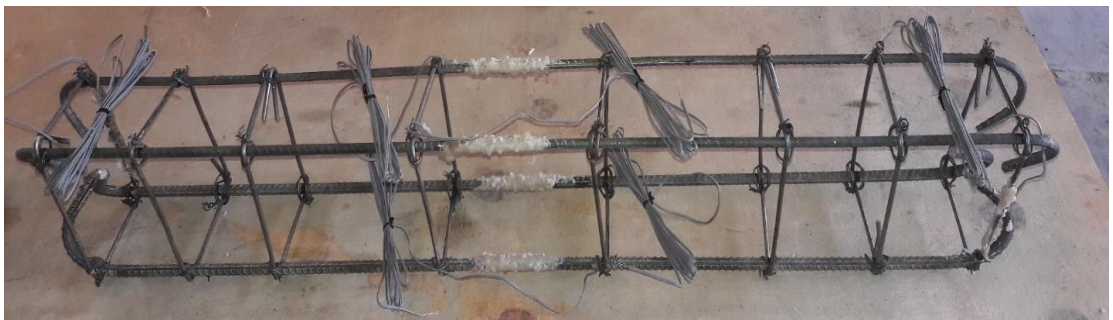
Typical reinforcement arrangement and geometry of the beam specimens tested
